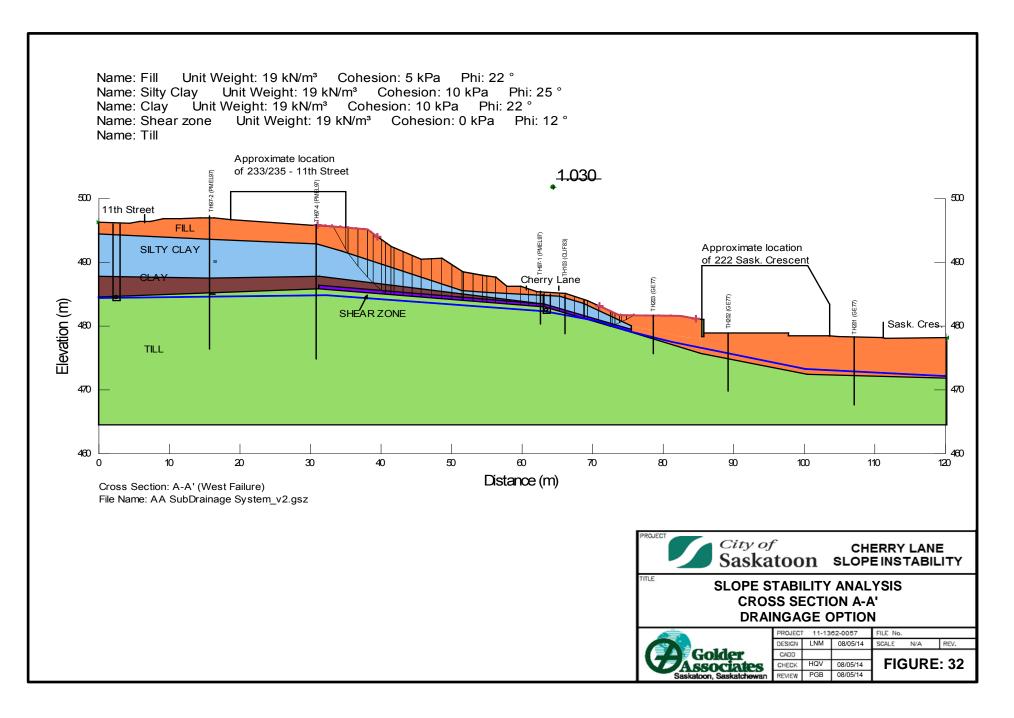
and Figure 33 show the stability analyses for this conceptual remedial option for the West Failure and East Failure, respectively. Installation of a drainage system in 11th Street East will require a minimum length of 135 m and a depth ranging between 8.6 m and 12.5 m. Installation of a drainage system in Cherry Lane will require a length of 135 m at a depth between 3.6 m and 8 m. Detailed design will refine the overall dimensions of this option.
